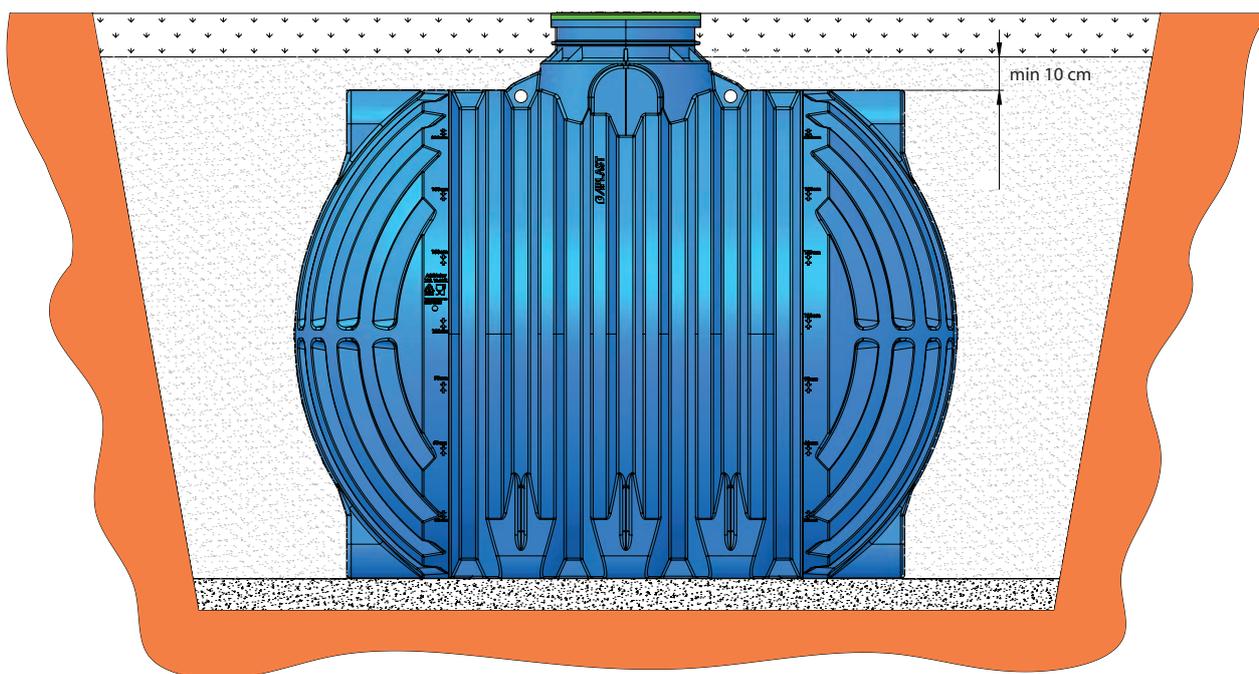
Minimum backfill of the TANK with backfill material before backfilling the last layer of soil
